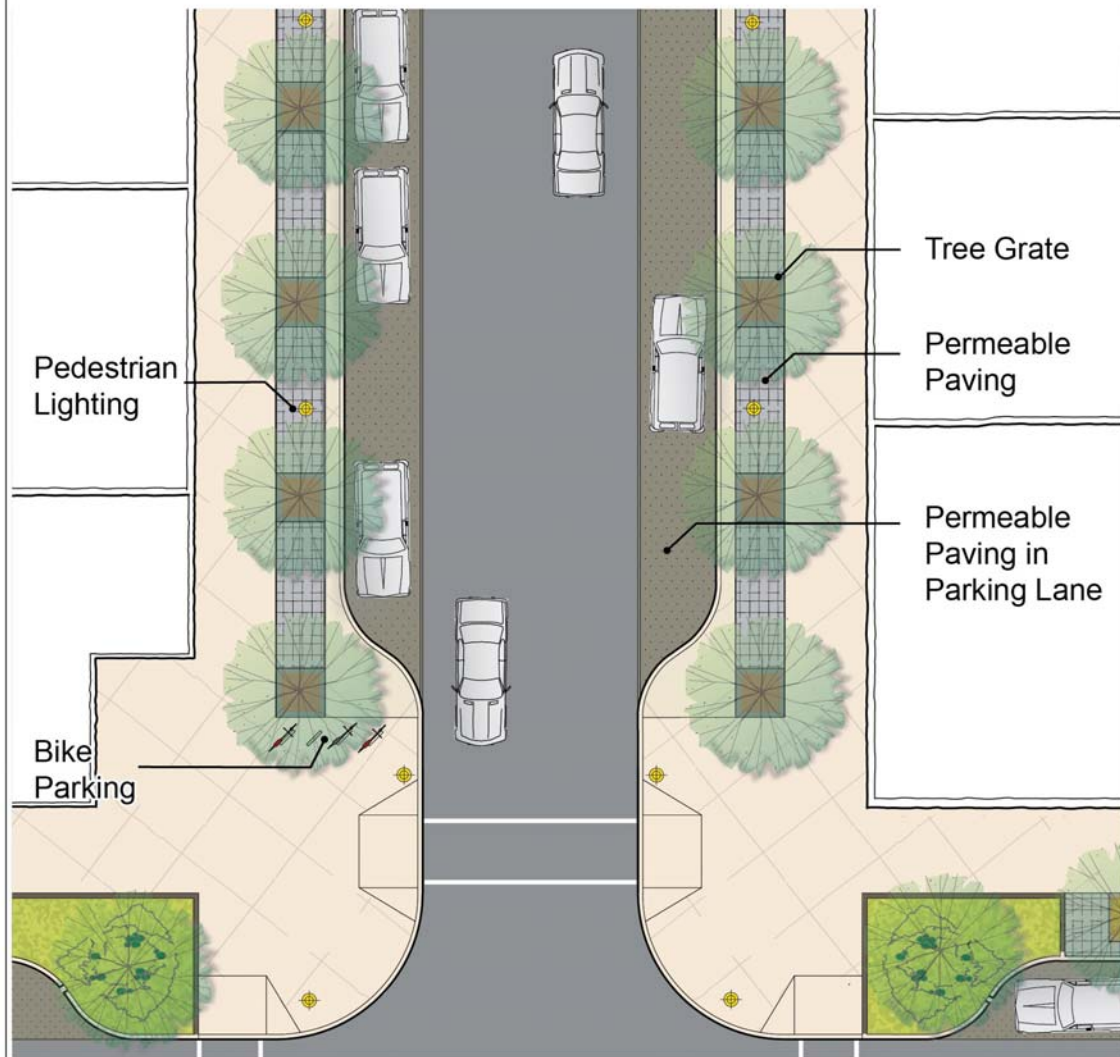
A PARKWAY STREET – NORTH OF PINE STREET AND SOUTH OF MADRONE STREET (AA TO BB AND DD TO EE)
